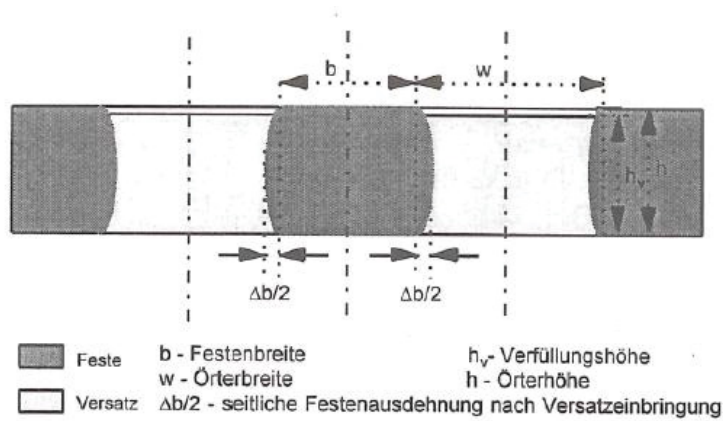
Sectional view of a room and pillar mine using backfill²⁵ p.51
